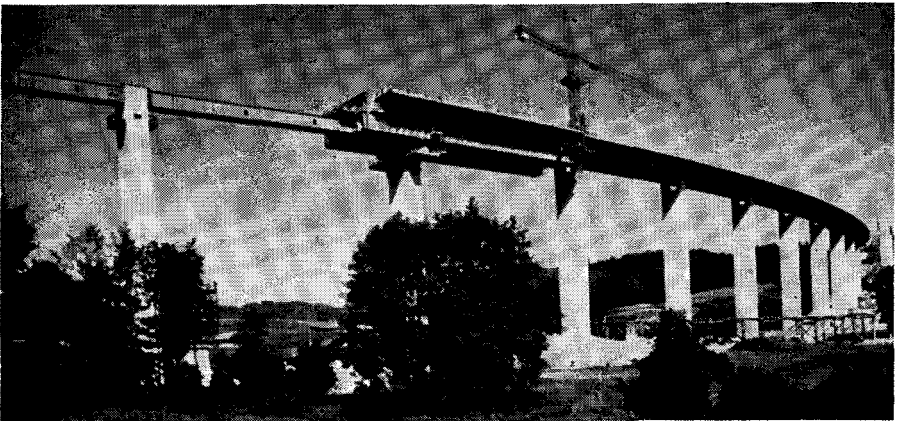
Traveling steel girders carrying formwork for span-by-span bridge construction.
